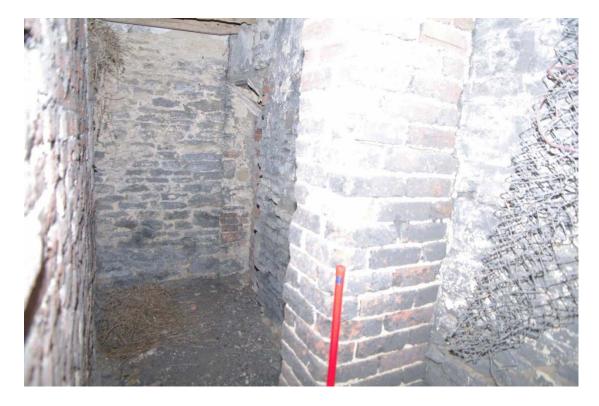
Farm House north facing elevation gable end blocked ground floor doorway. Looking south-east
